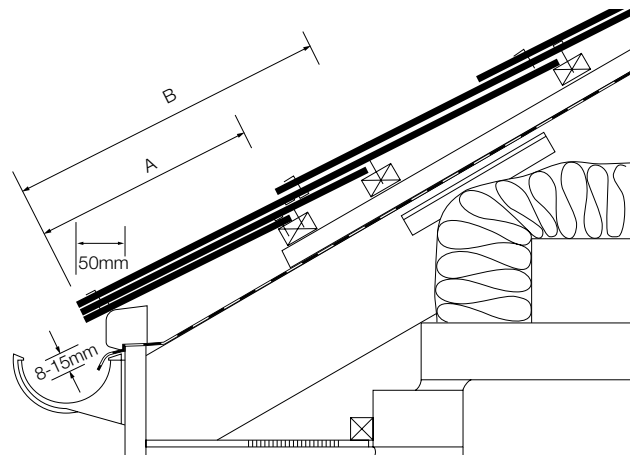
Detailing at eaves when installing breather membrane and counterbattens
